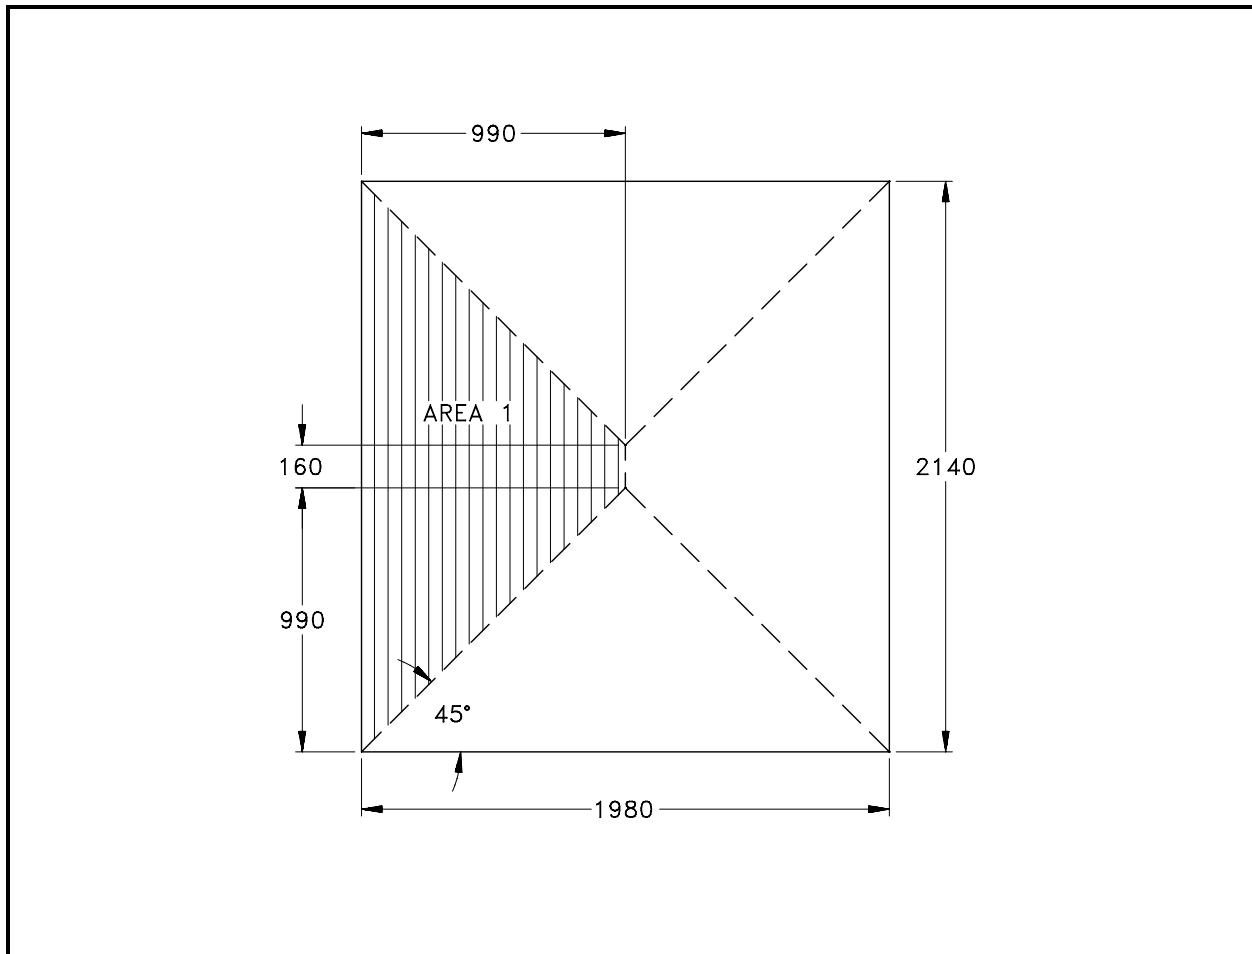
View of Area 1 on End Sheet Used to Calculate End Edge Load on Sidewall
